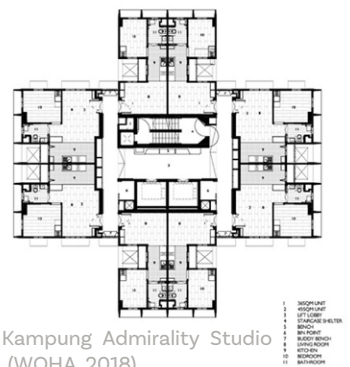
Kampung Admiralty Studio Floor Plan, (WOHA, 2018)
